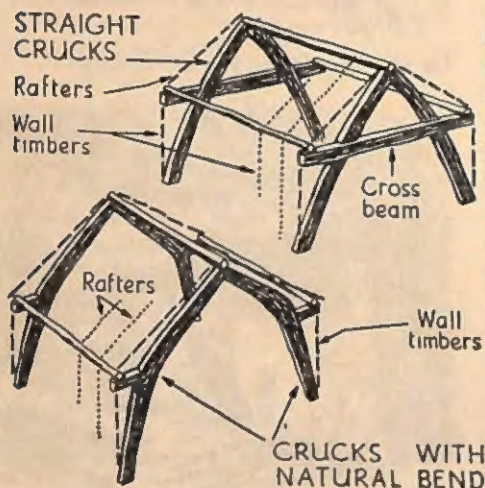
How building with crucks and cross-beams led to the vertical side wall.
